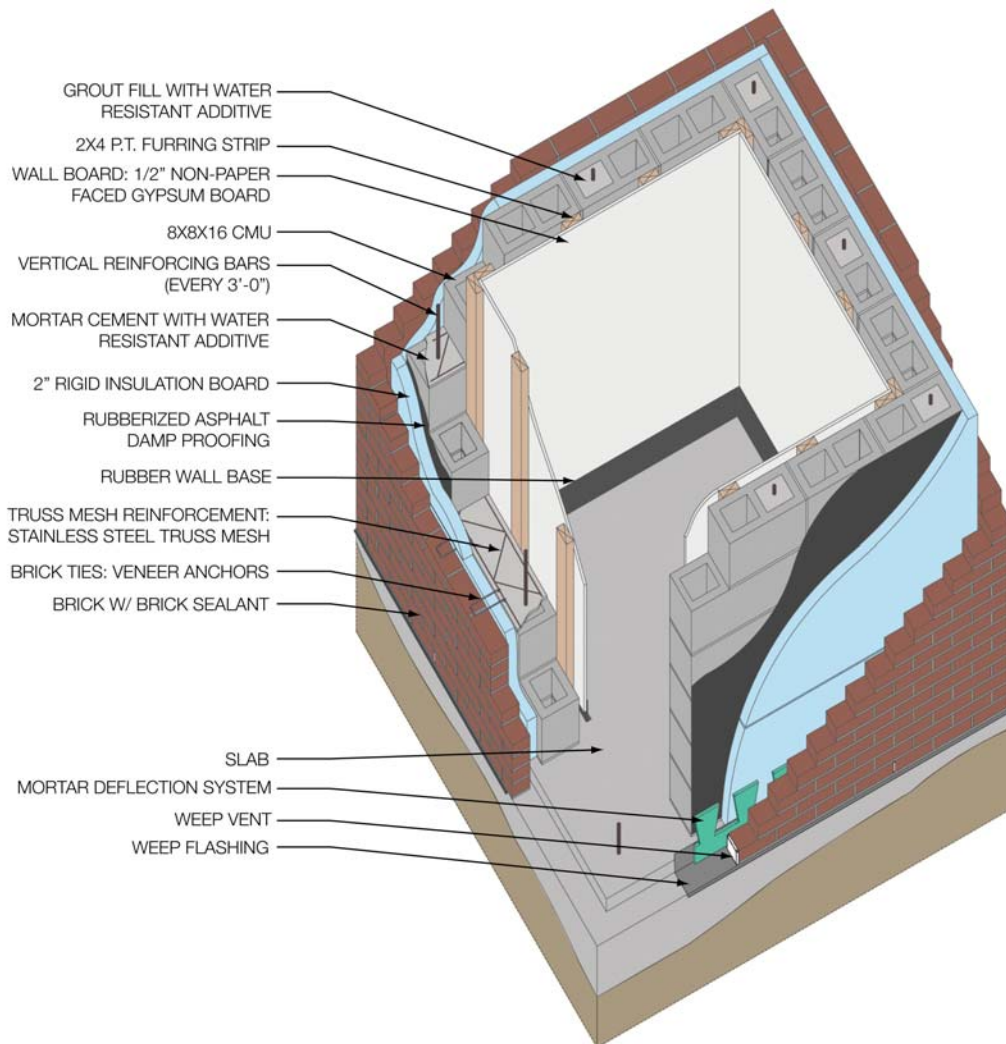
DIAGRAM: test pod B: cavity wall.
